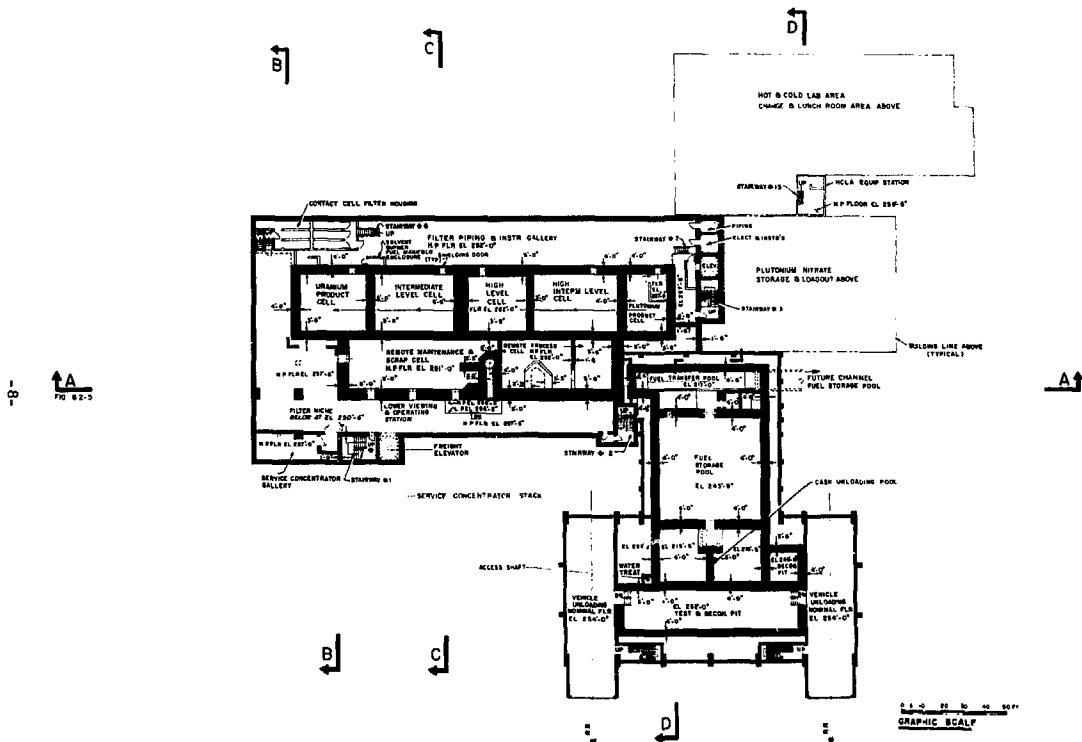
Plan view of general arrangement of Barnwell Process Building and Fuel Receiving and Storage Station.
